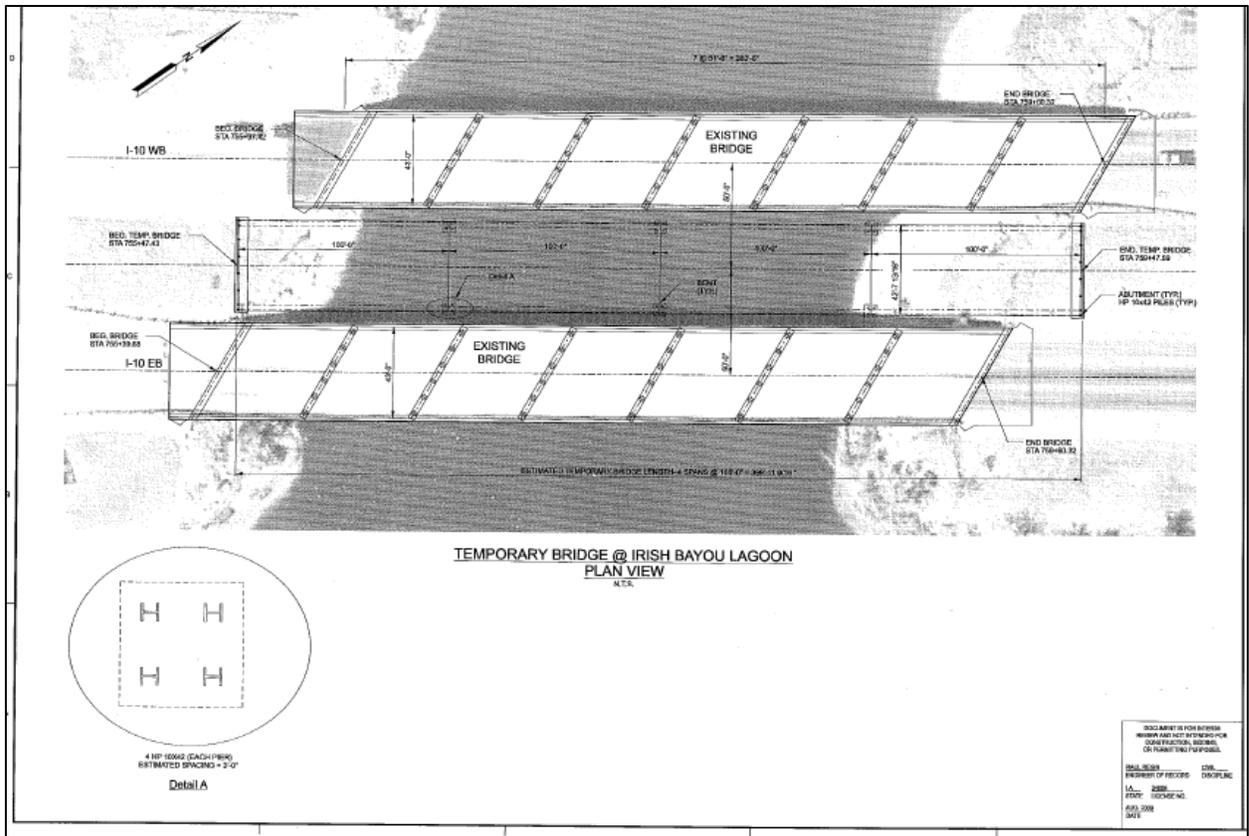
Construction plan view of the temporary traffic control bridge and detail for placement of H-piles.
